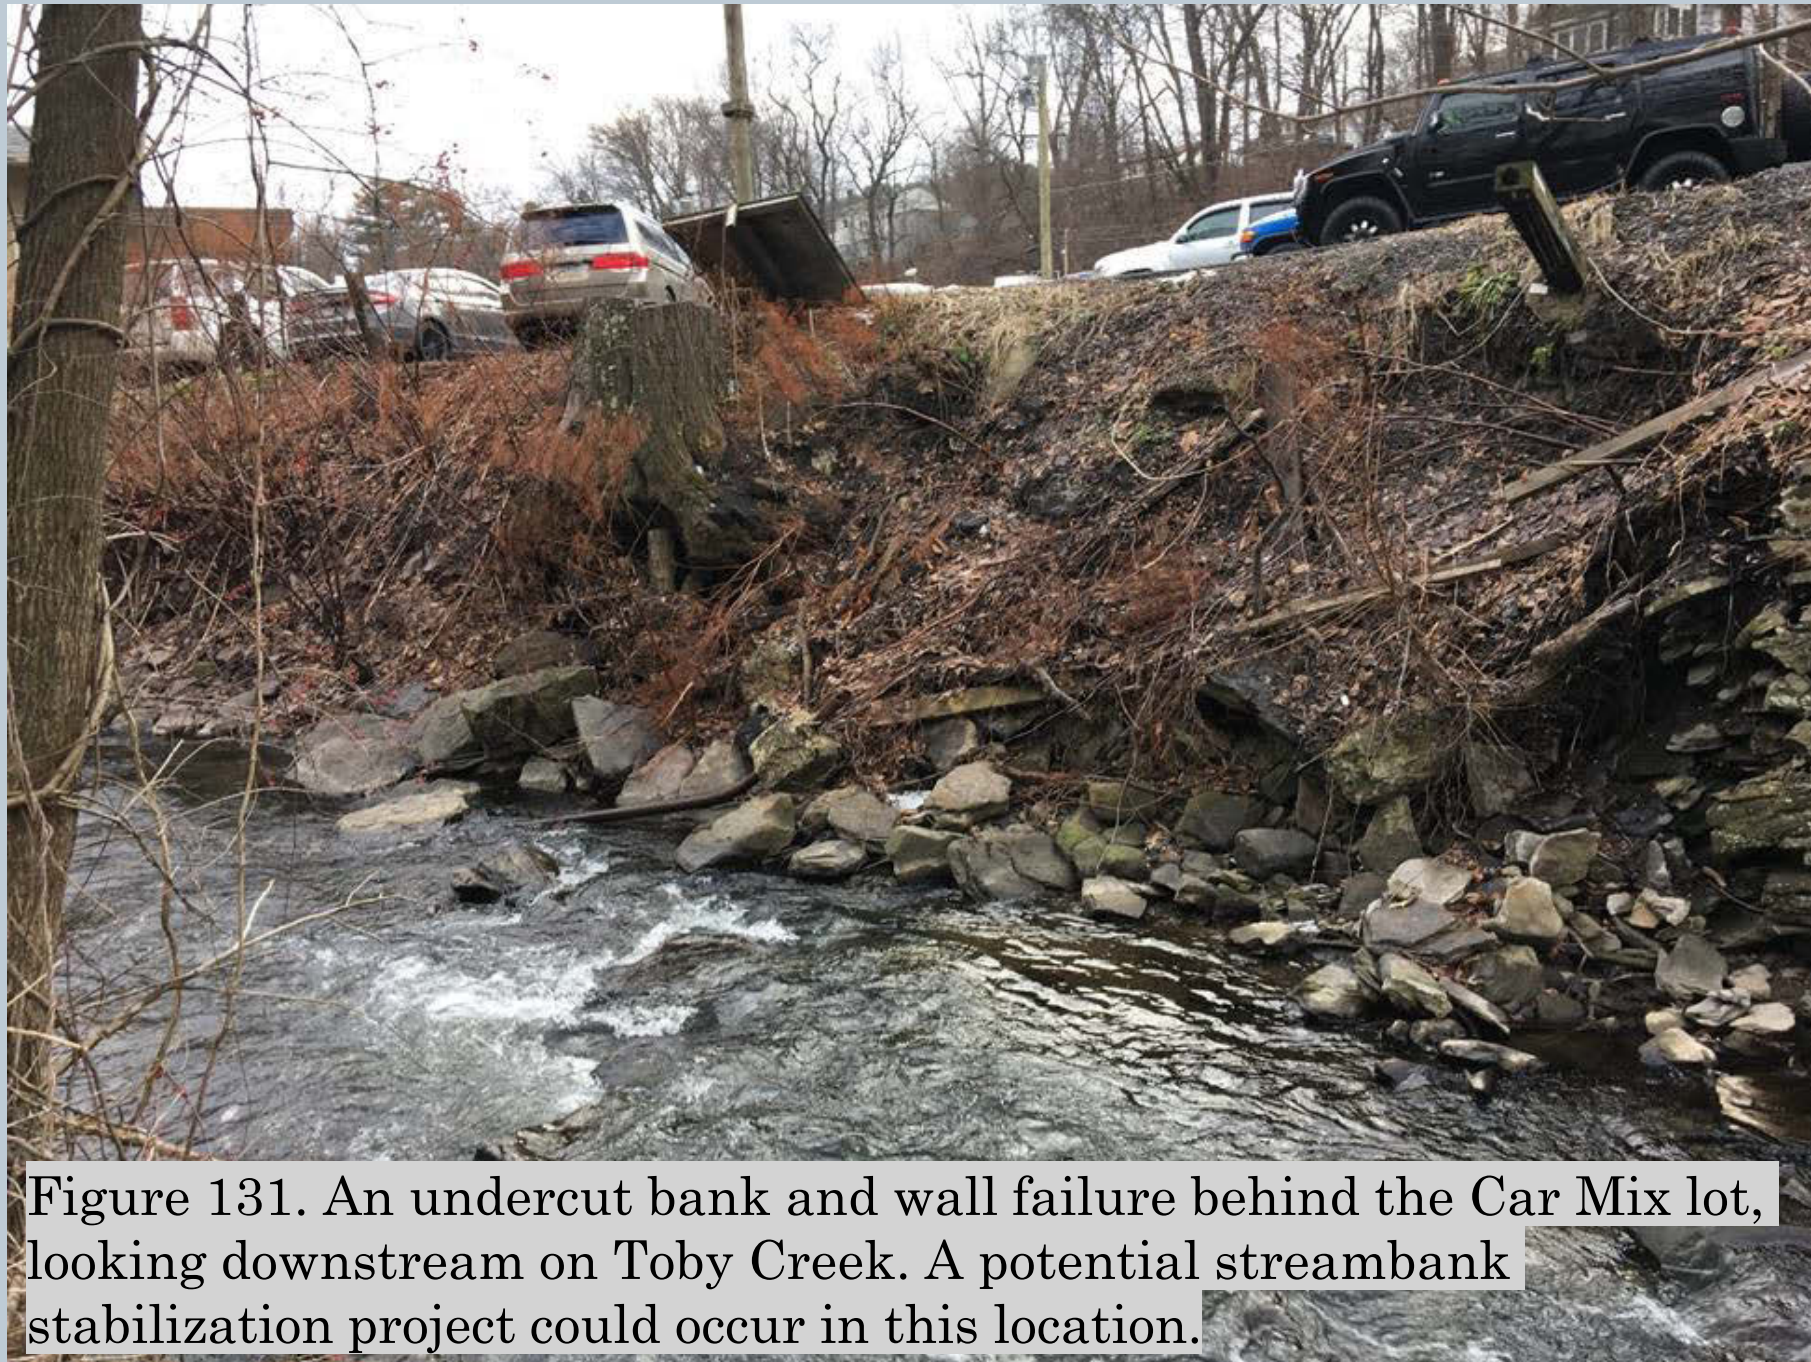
An undercut bank and wall failure behind the Car Mix lot, looking downstream on Toby Creek. A potential streambank stabilization project could occur in this location.
